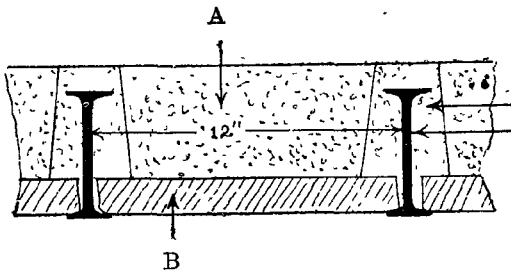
A—Any cheap stuff; B—Paving Slab.
